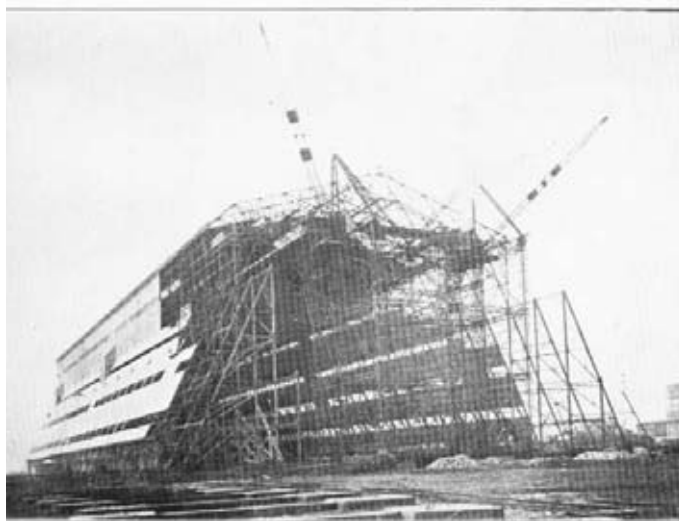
Shed, showing new "A" Frames to extensions in course of erection.
